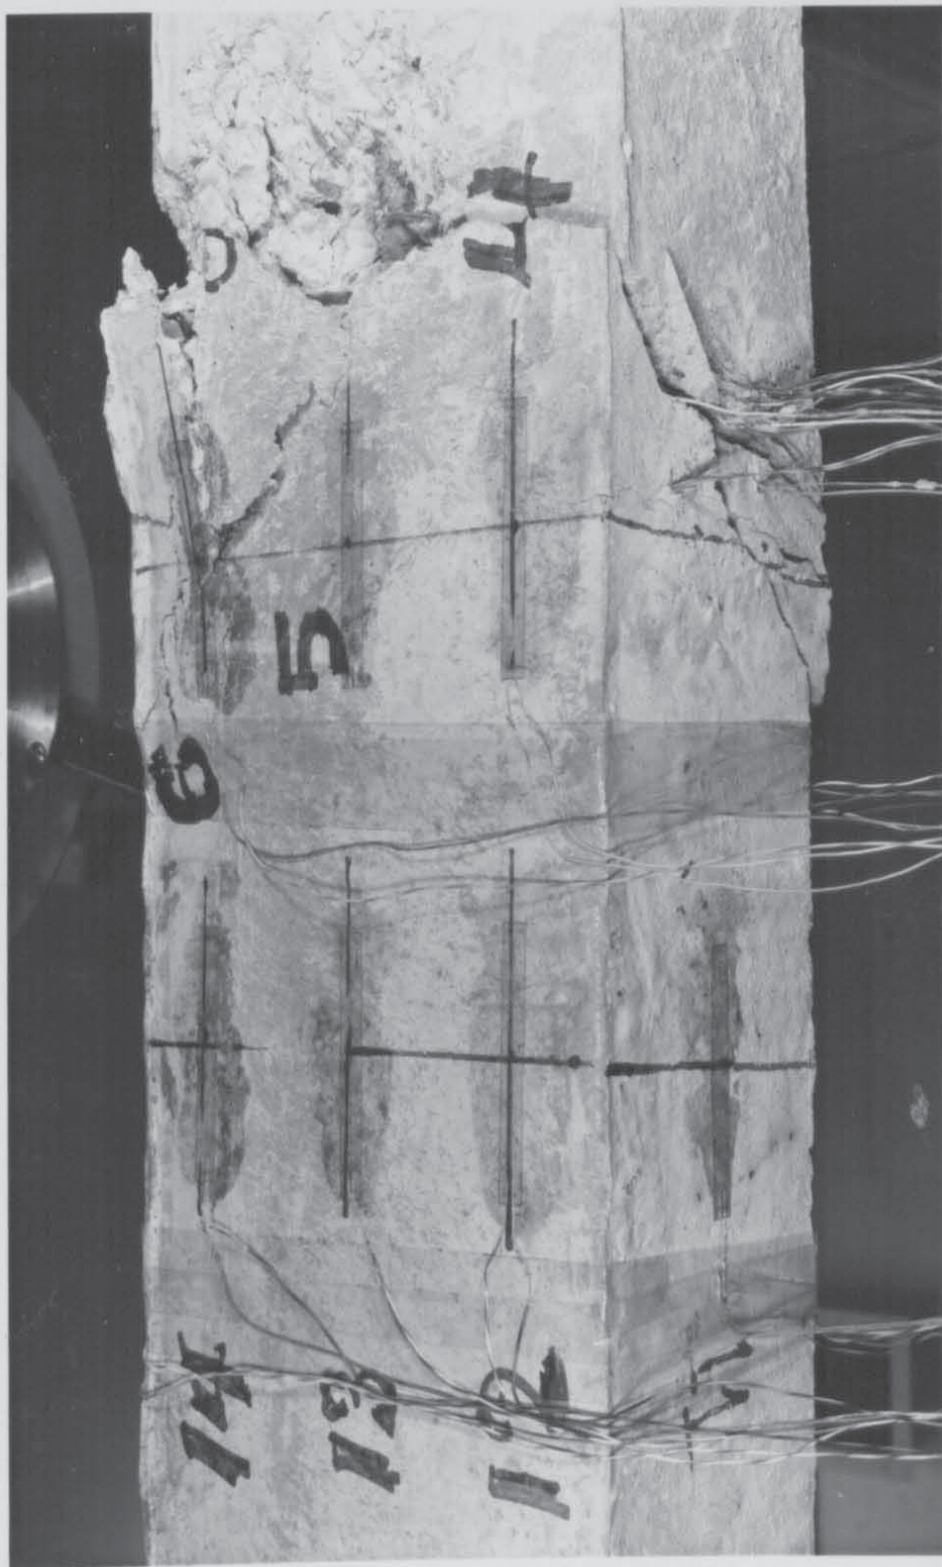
FAILURE CRACKING PATTERN OF BEAM B-6. A FRONT FACE VIEW.
